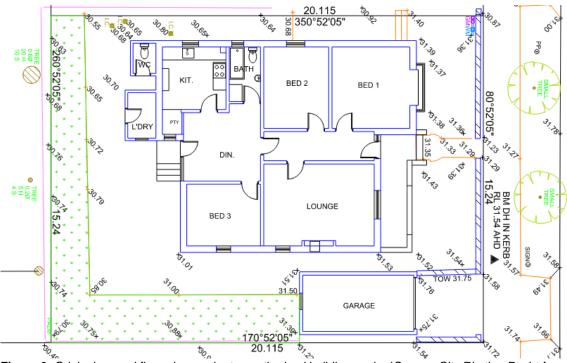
Original ground floor plan - prior to unathorised building works (Source: City Rhythm Pty Ltd)
